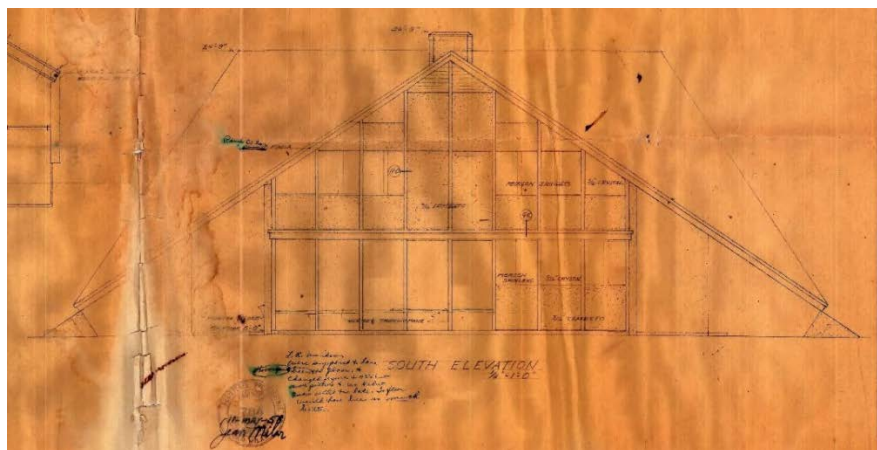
South Elevation showing roof line, central chimney, and southern elevation.¹⁵
